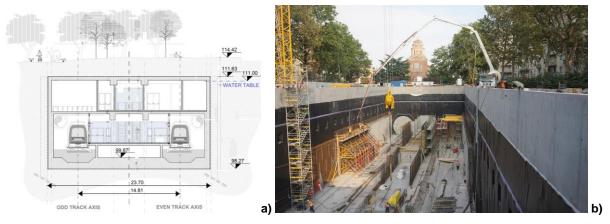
Argonne Station: a) Detail of the reinforced concrete piling; b) general view
